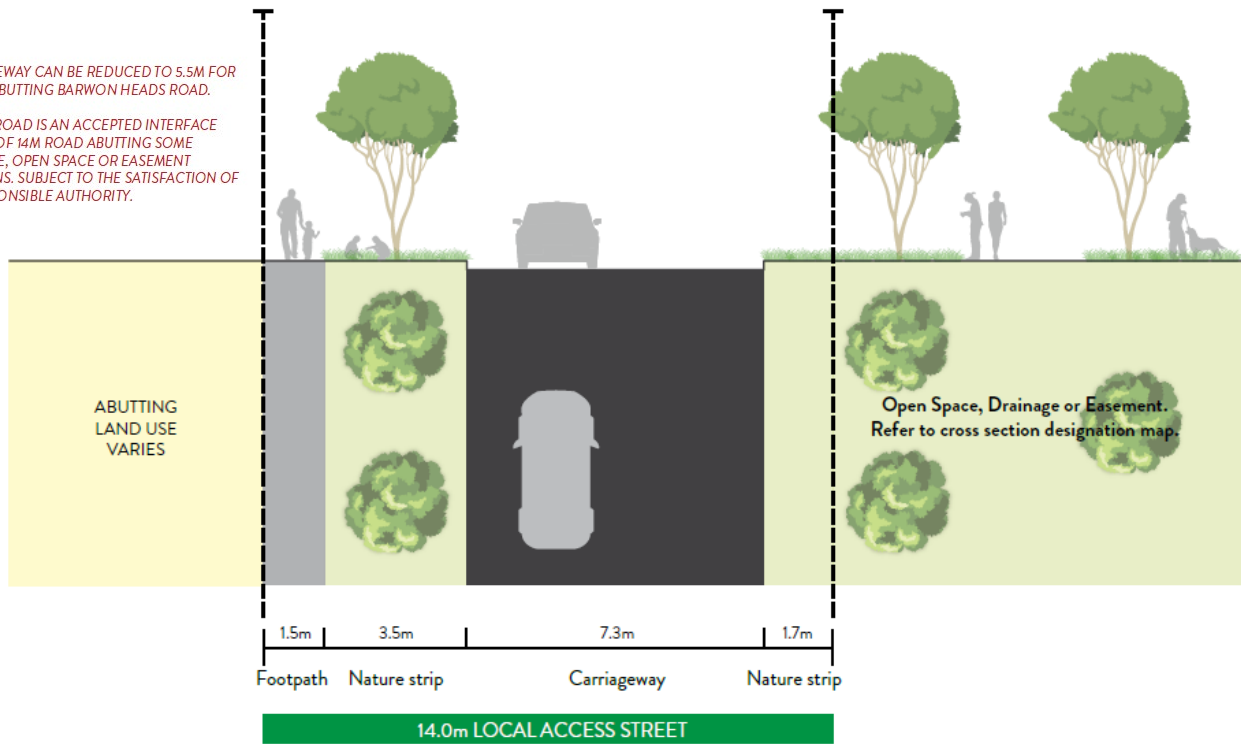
Cross Section M - 14m Local Access Street (Level 1) Abutting Open Space, Drainage, Easements, Barwon Heads Road (Draft Marshall PSP)
